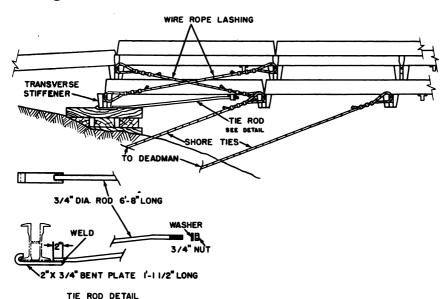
Bracing scheme, superimposed end span, reinforced M4 floating bridge.
